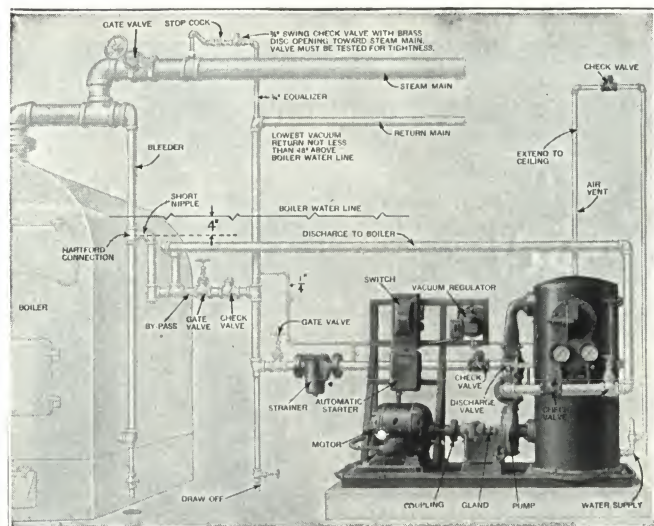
Unit Completely Equipped with Automatic Vacuum Control
